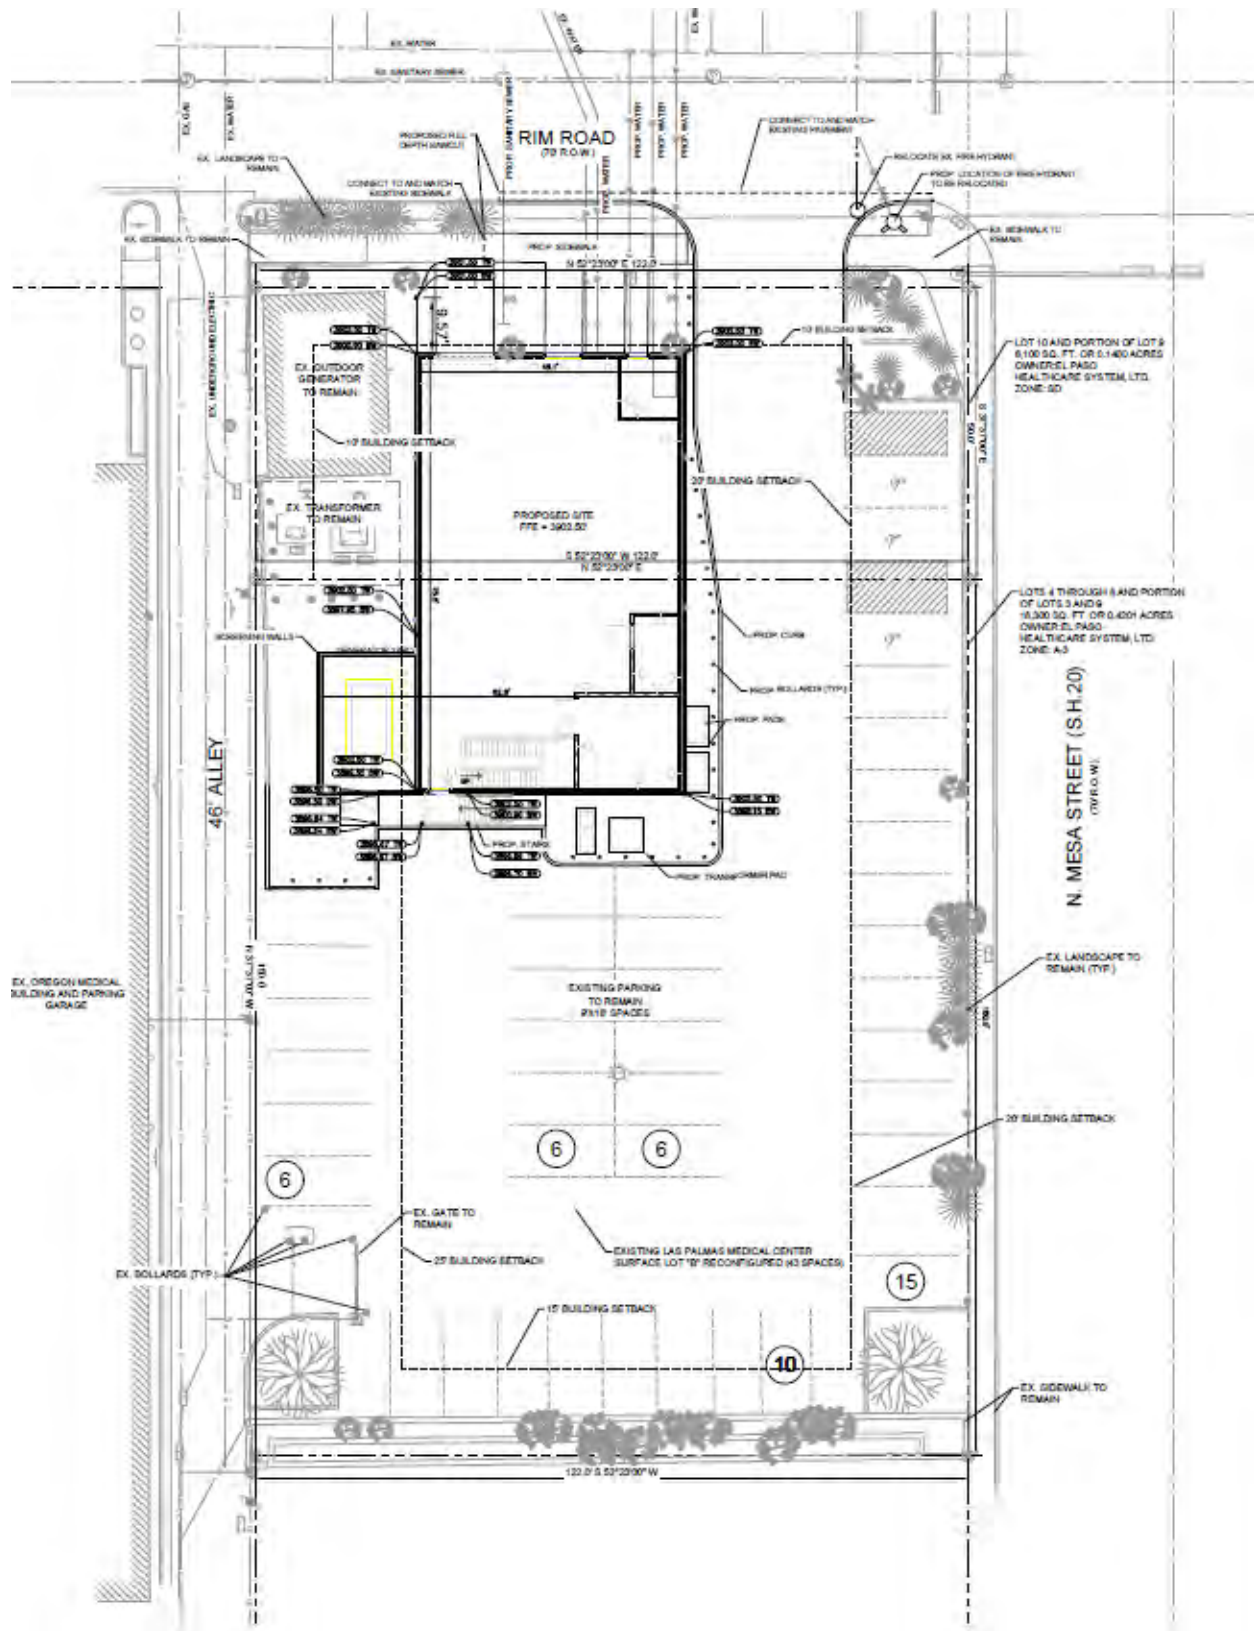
Existing Lot 7 (LifeCare Center) Parking Layout
